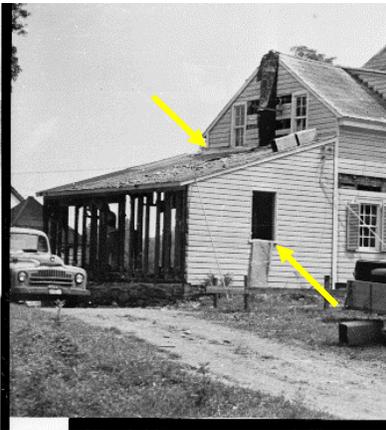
Cropped HABS photograph to show the previous kitchen structure at the north. Note the roof slope and window at the west facade.
